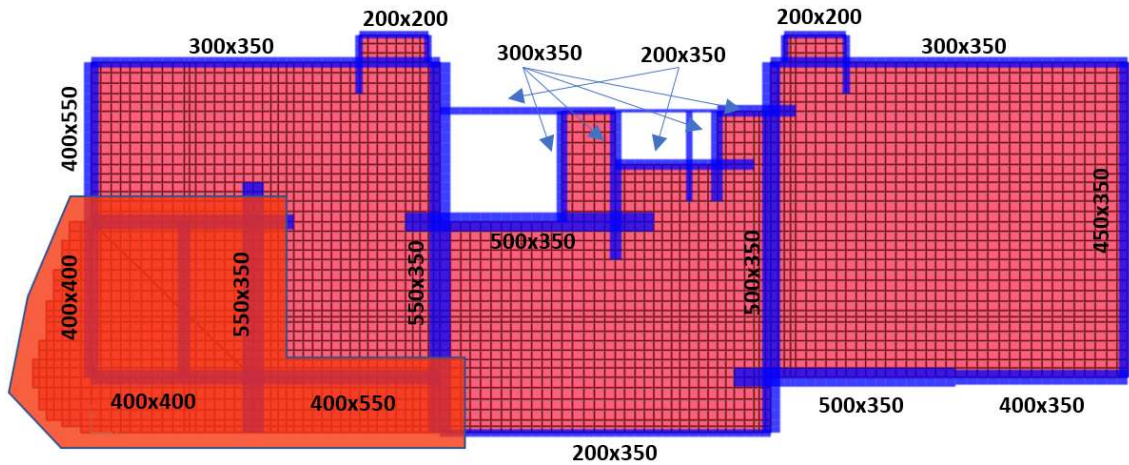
Building floor slab: solid slab area highlighted in the plan view, beam cross section dimensions shown.
